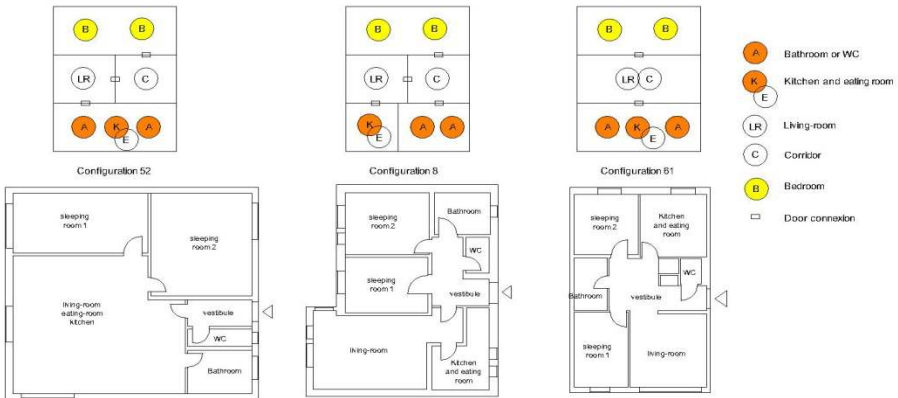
Three examples of topological configurations which are well adapted to cascade ventilation with examples of floor plan.
